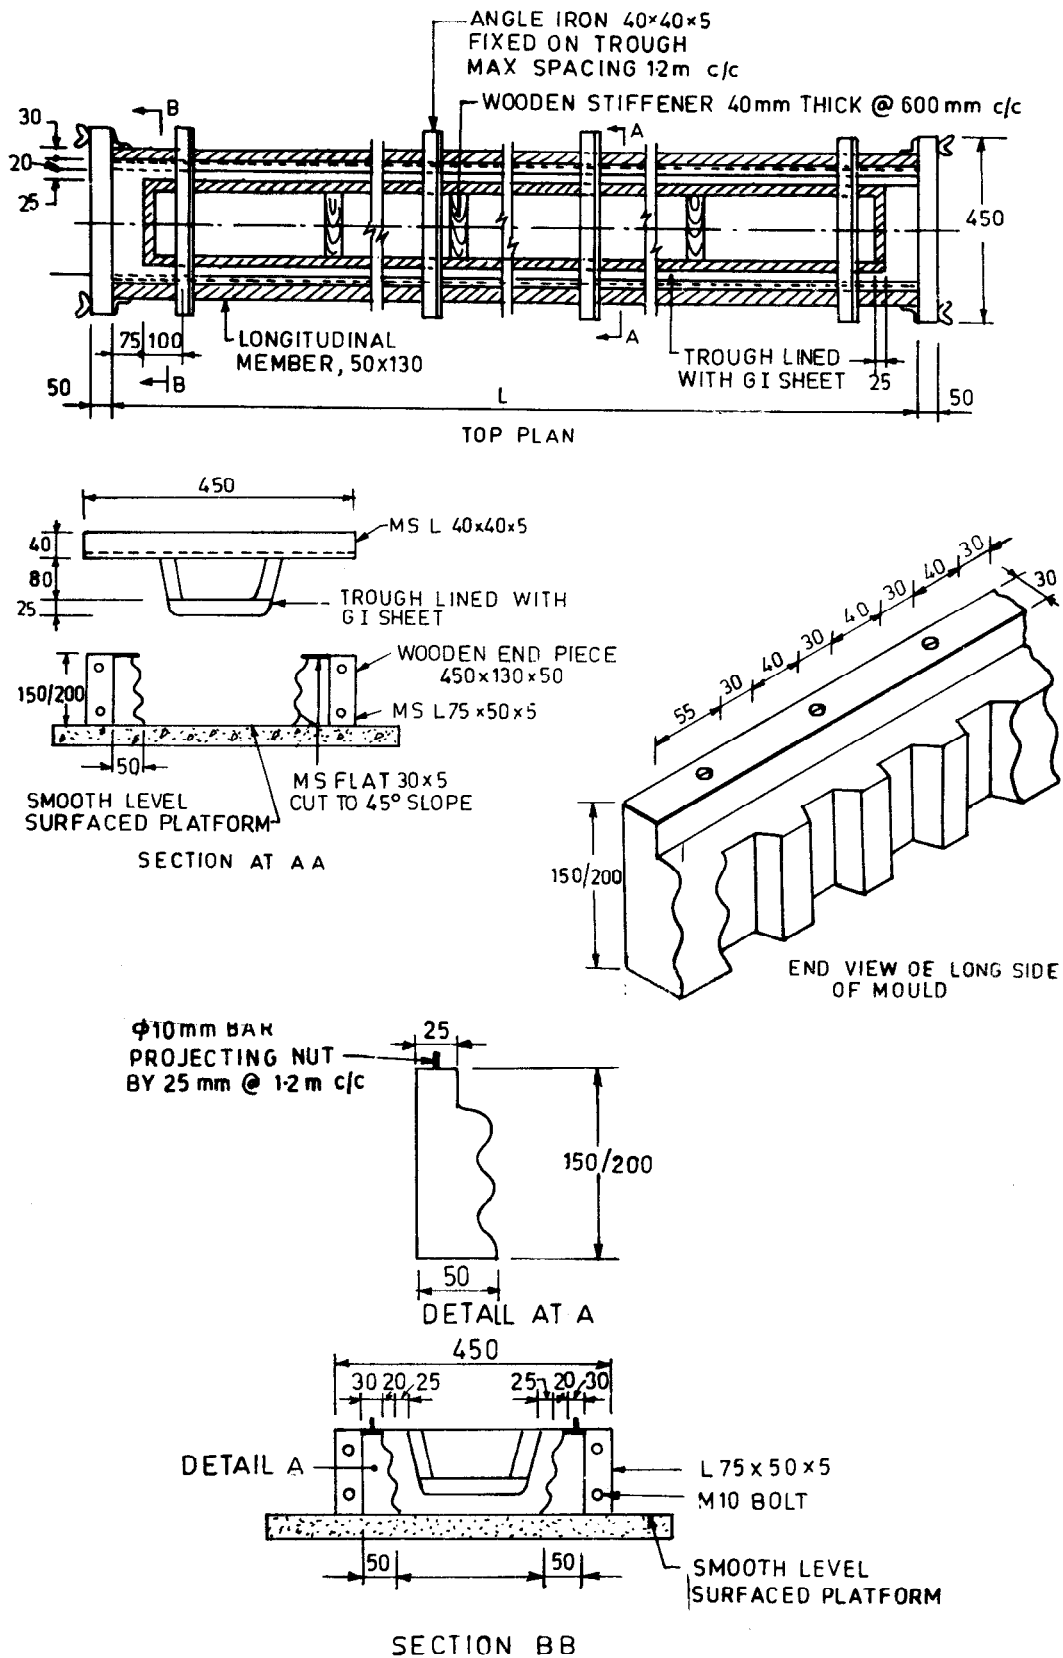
DETAILS OF MOULD FOR CHANNEL UNIT
